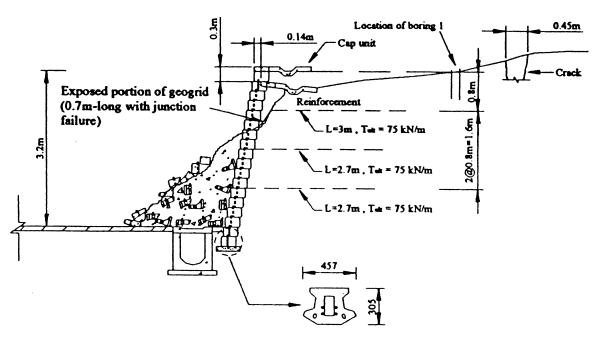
Cross section of the collapsed geosynthetic reinforced modular block wall (Huang 2000)
